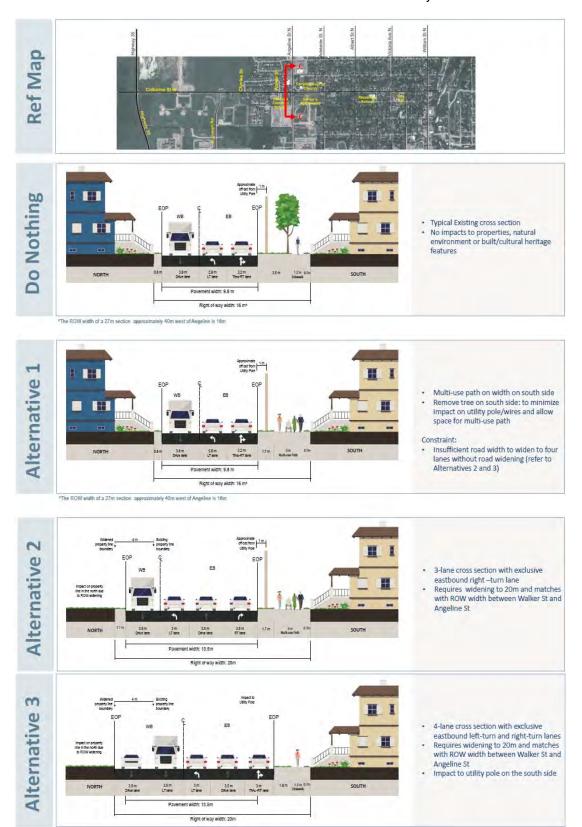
Segment C: Colborne Street - West of Angeline Street
